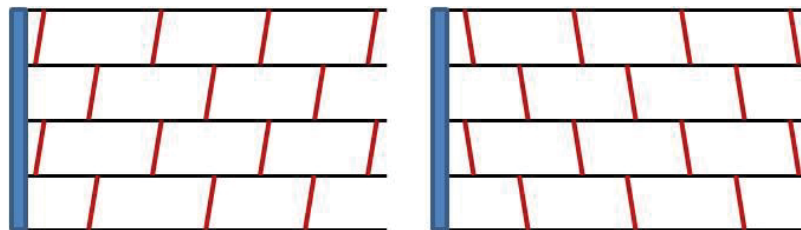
A typical reinforced soil wall using vertical reinforcement
